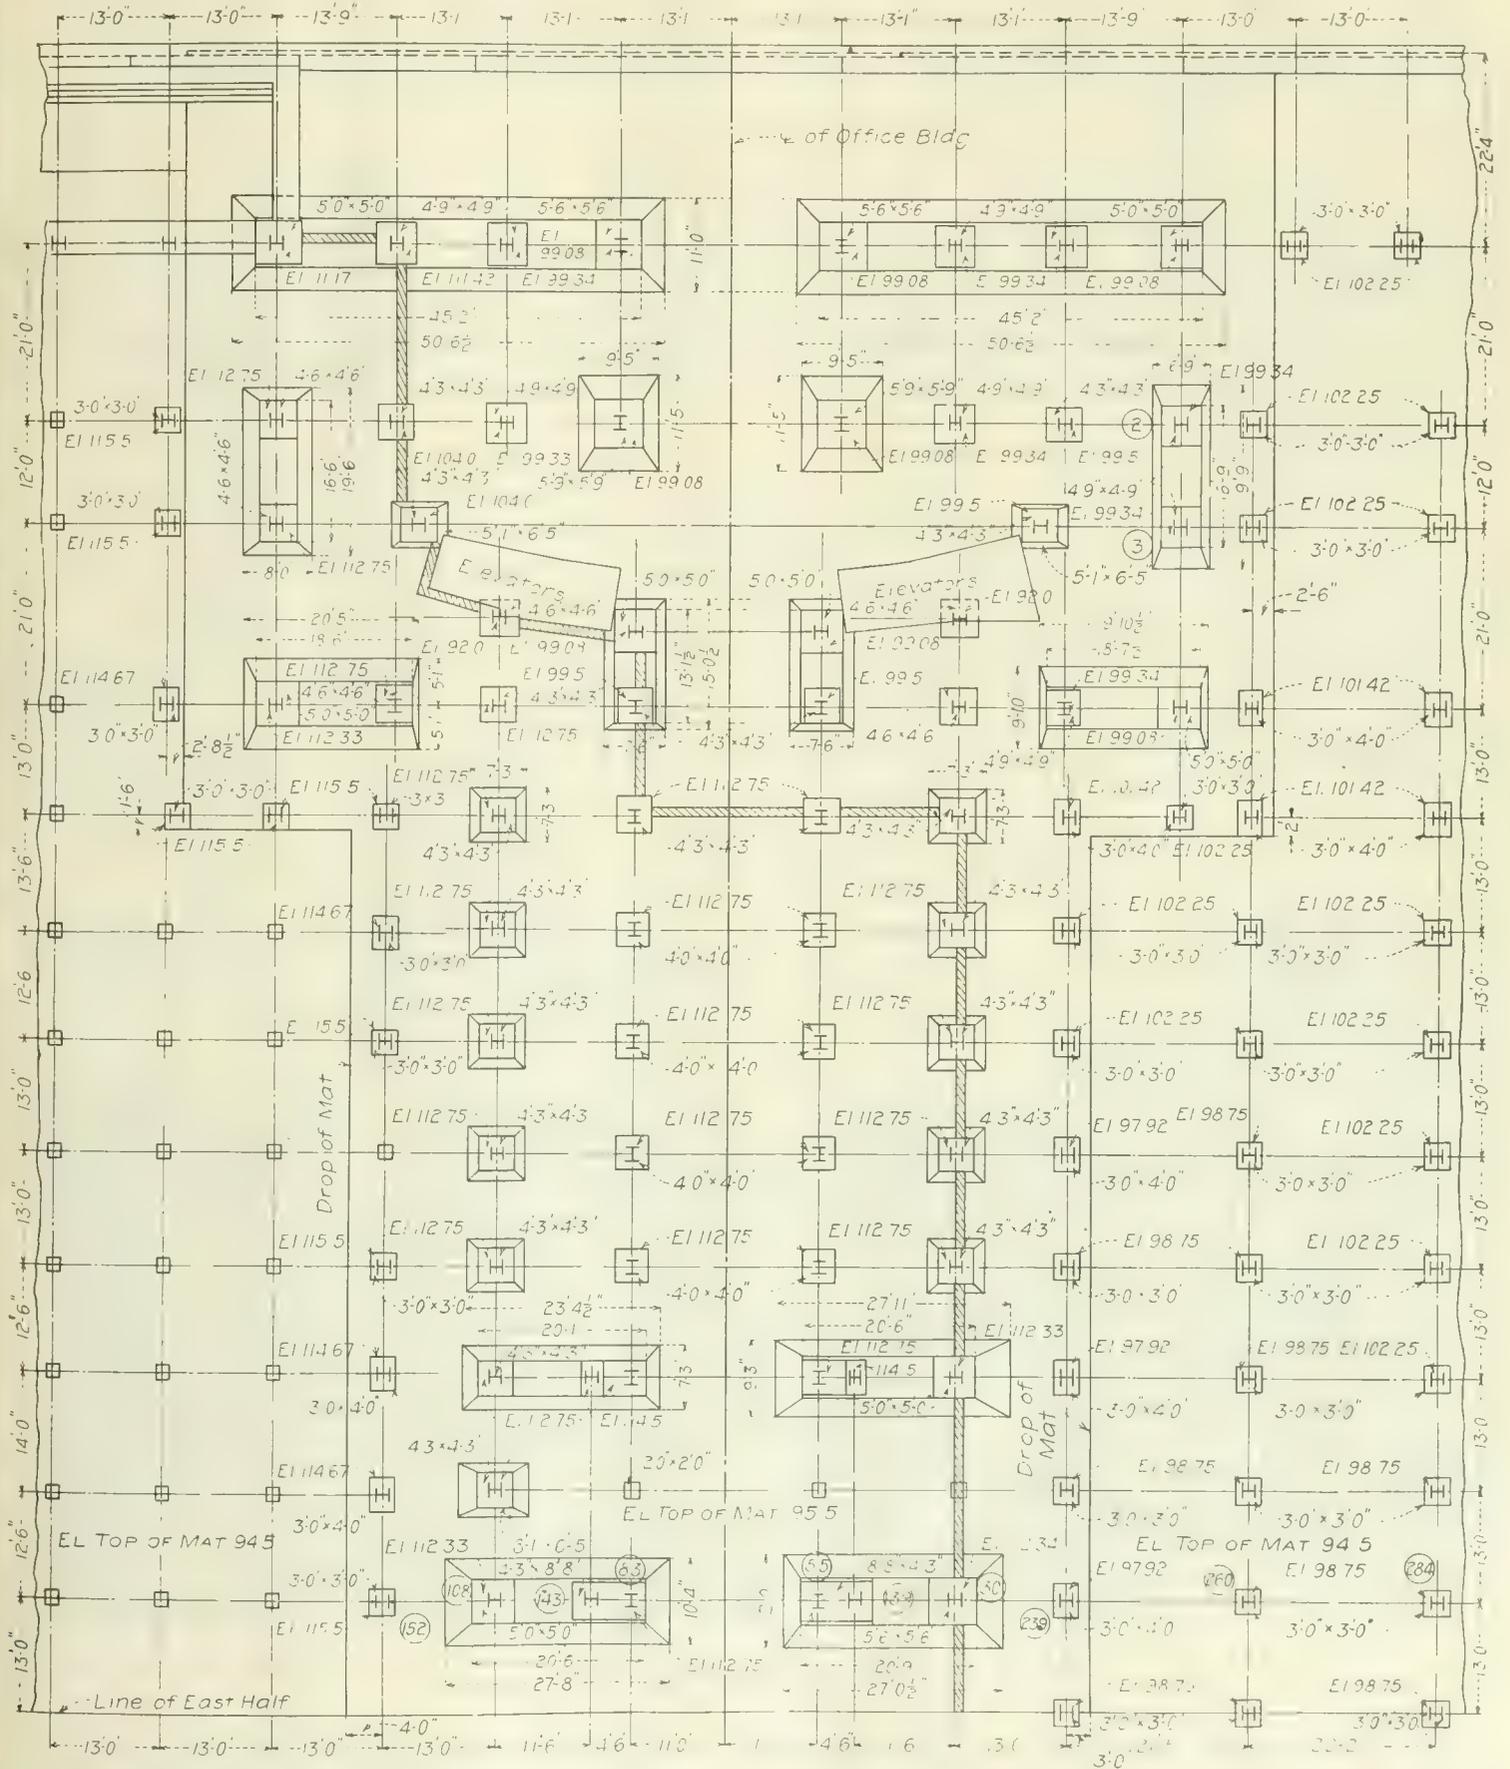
Foundation Plan of East Half of Michigan Central Station and Office Building, Detroit, Mich.—Plan Shows Portion Under Office Building and Central Part of Station.—Change in Thickness of Concrete Mat Indicated by Heavy Lines.
